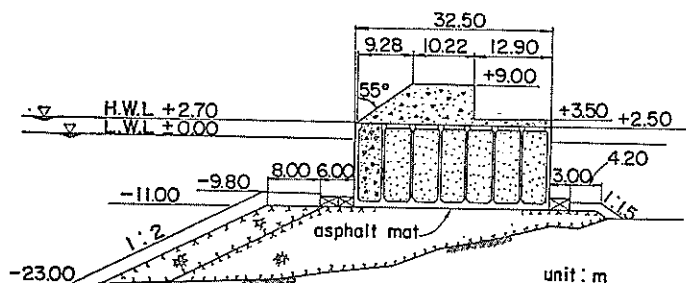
Cross Section of Sloping Top Caisson Breakwater at Katadomari Port
